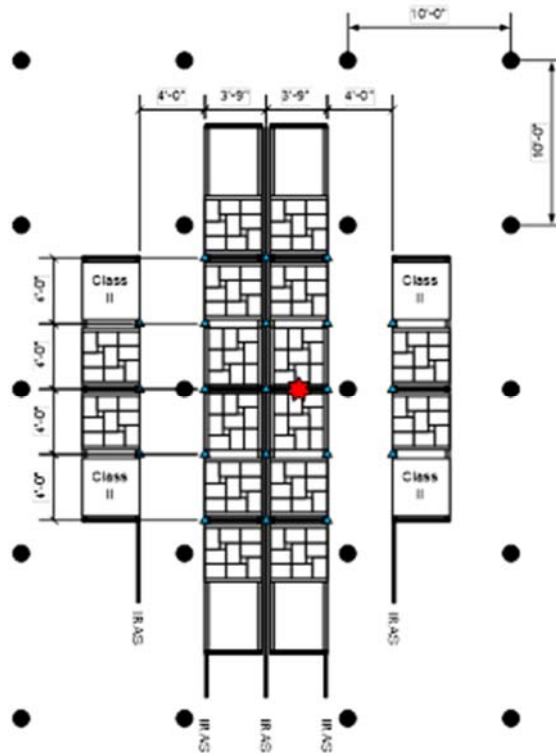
Schematic Plan View of Test Array (Test 4)
